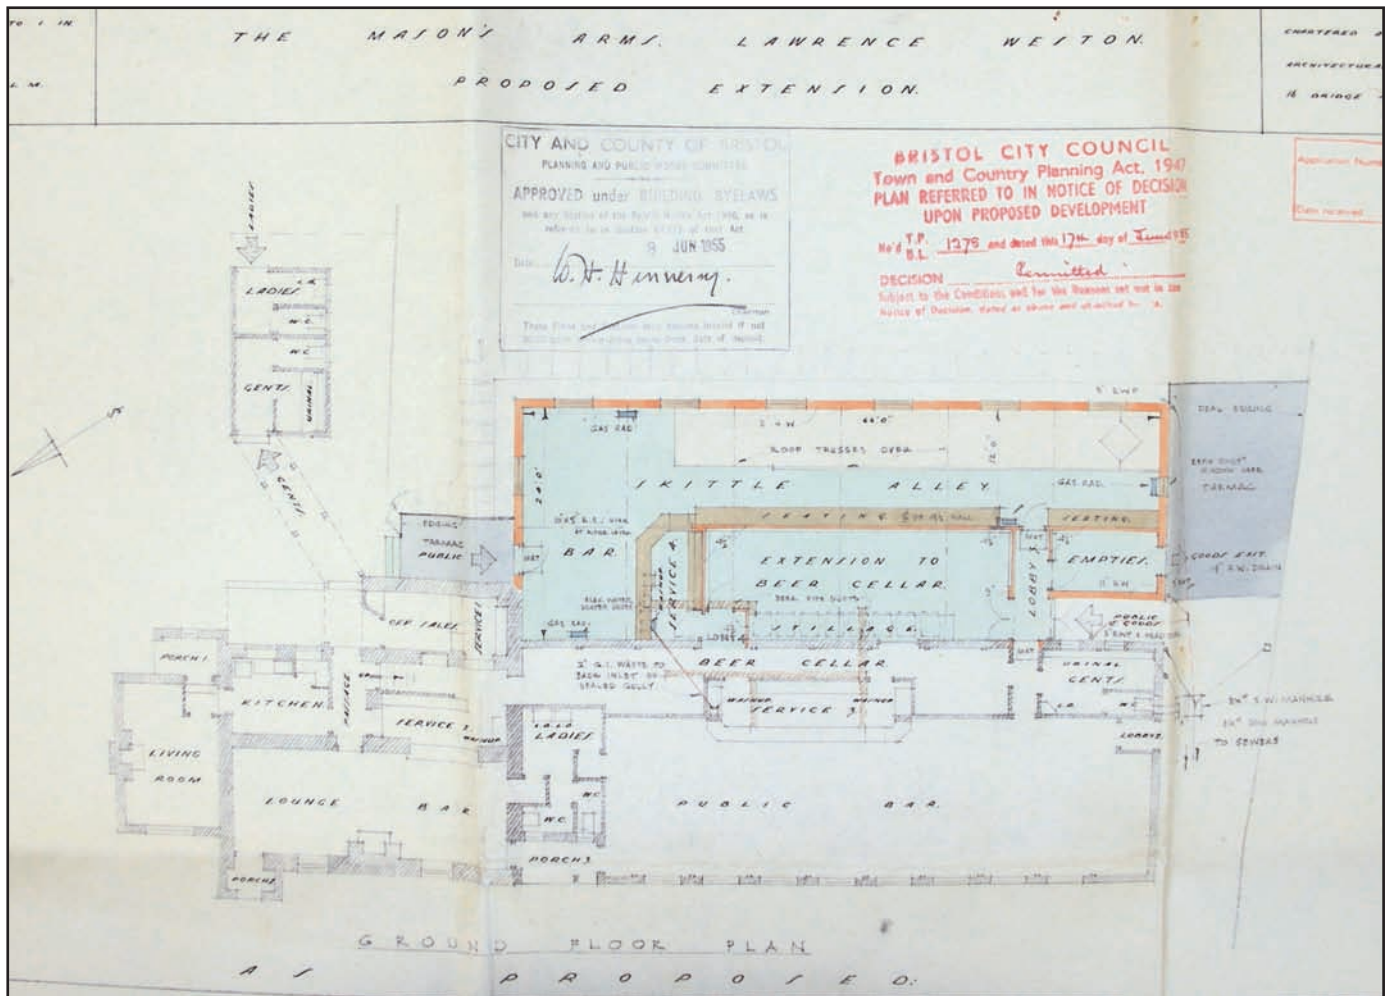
Architectural drawing (ground-floor plan) for proposed alterations and extension to the Masons Arms, dated 1954 (BCC)
